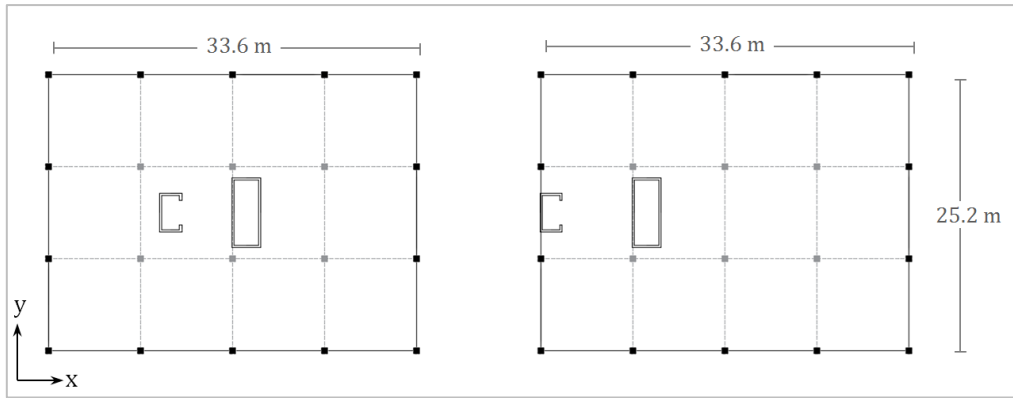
2-storey building plans with plan symmetry and asymmetry
